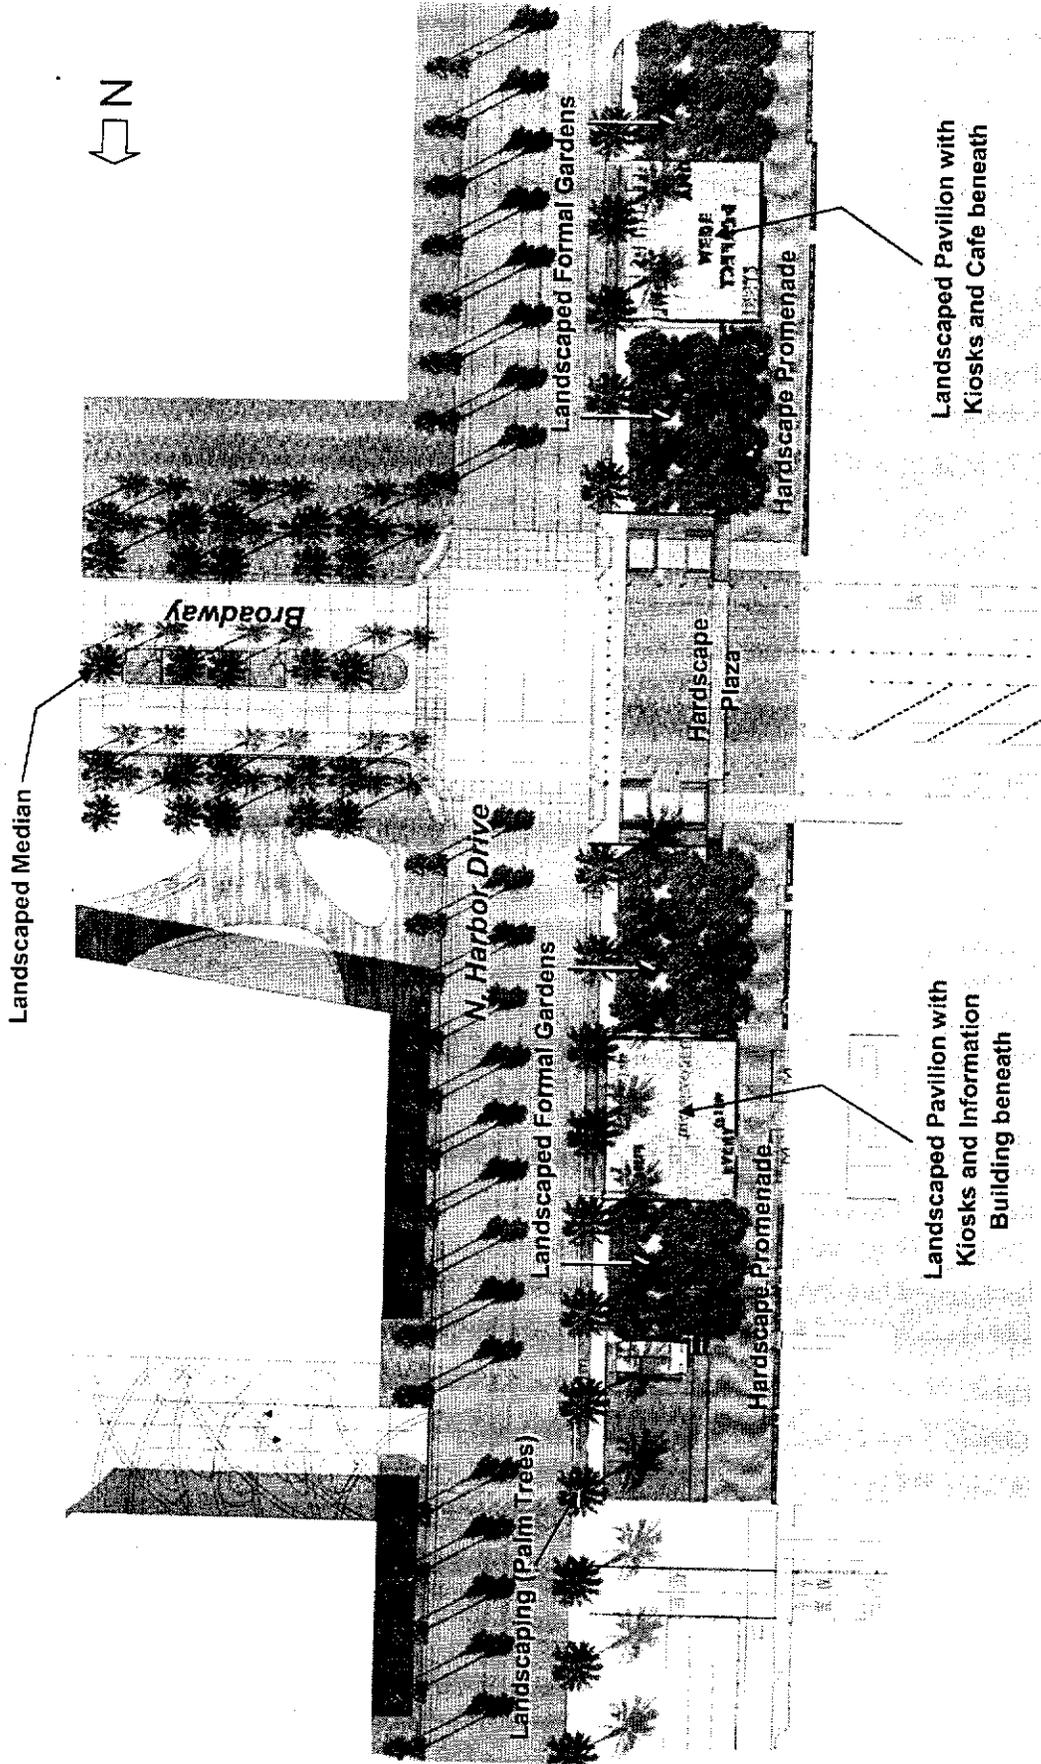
Proposed Project Landscape and Hardscape features
